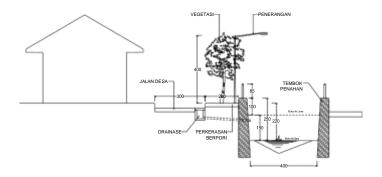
Plan worth the river Kampung Baru village after structuring (author analysis, 2020)
